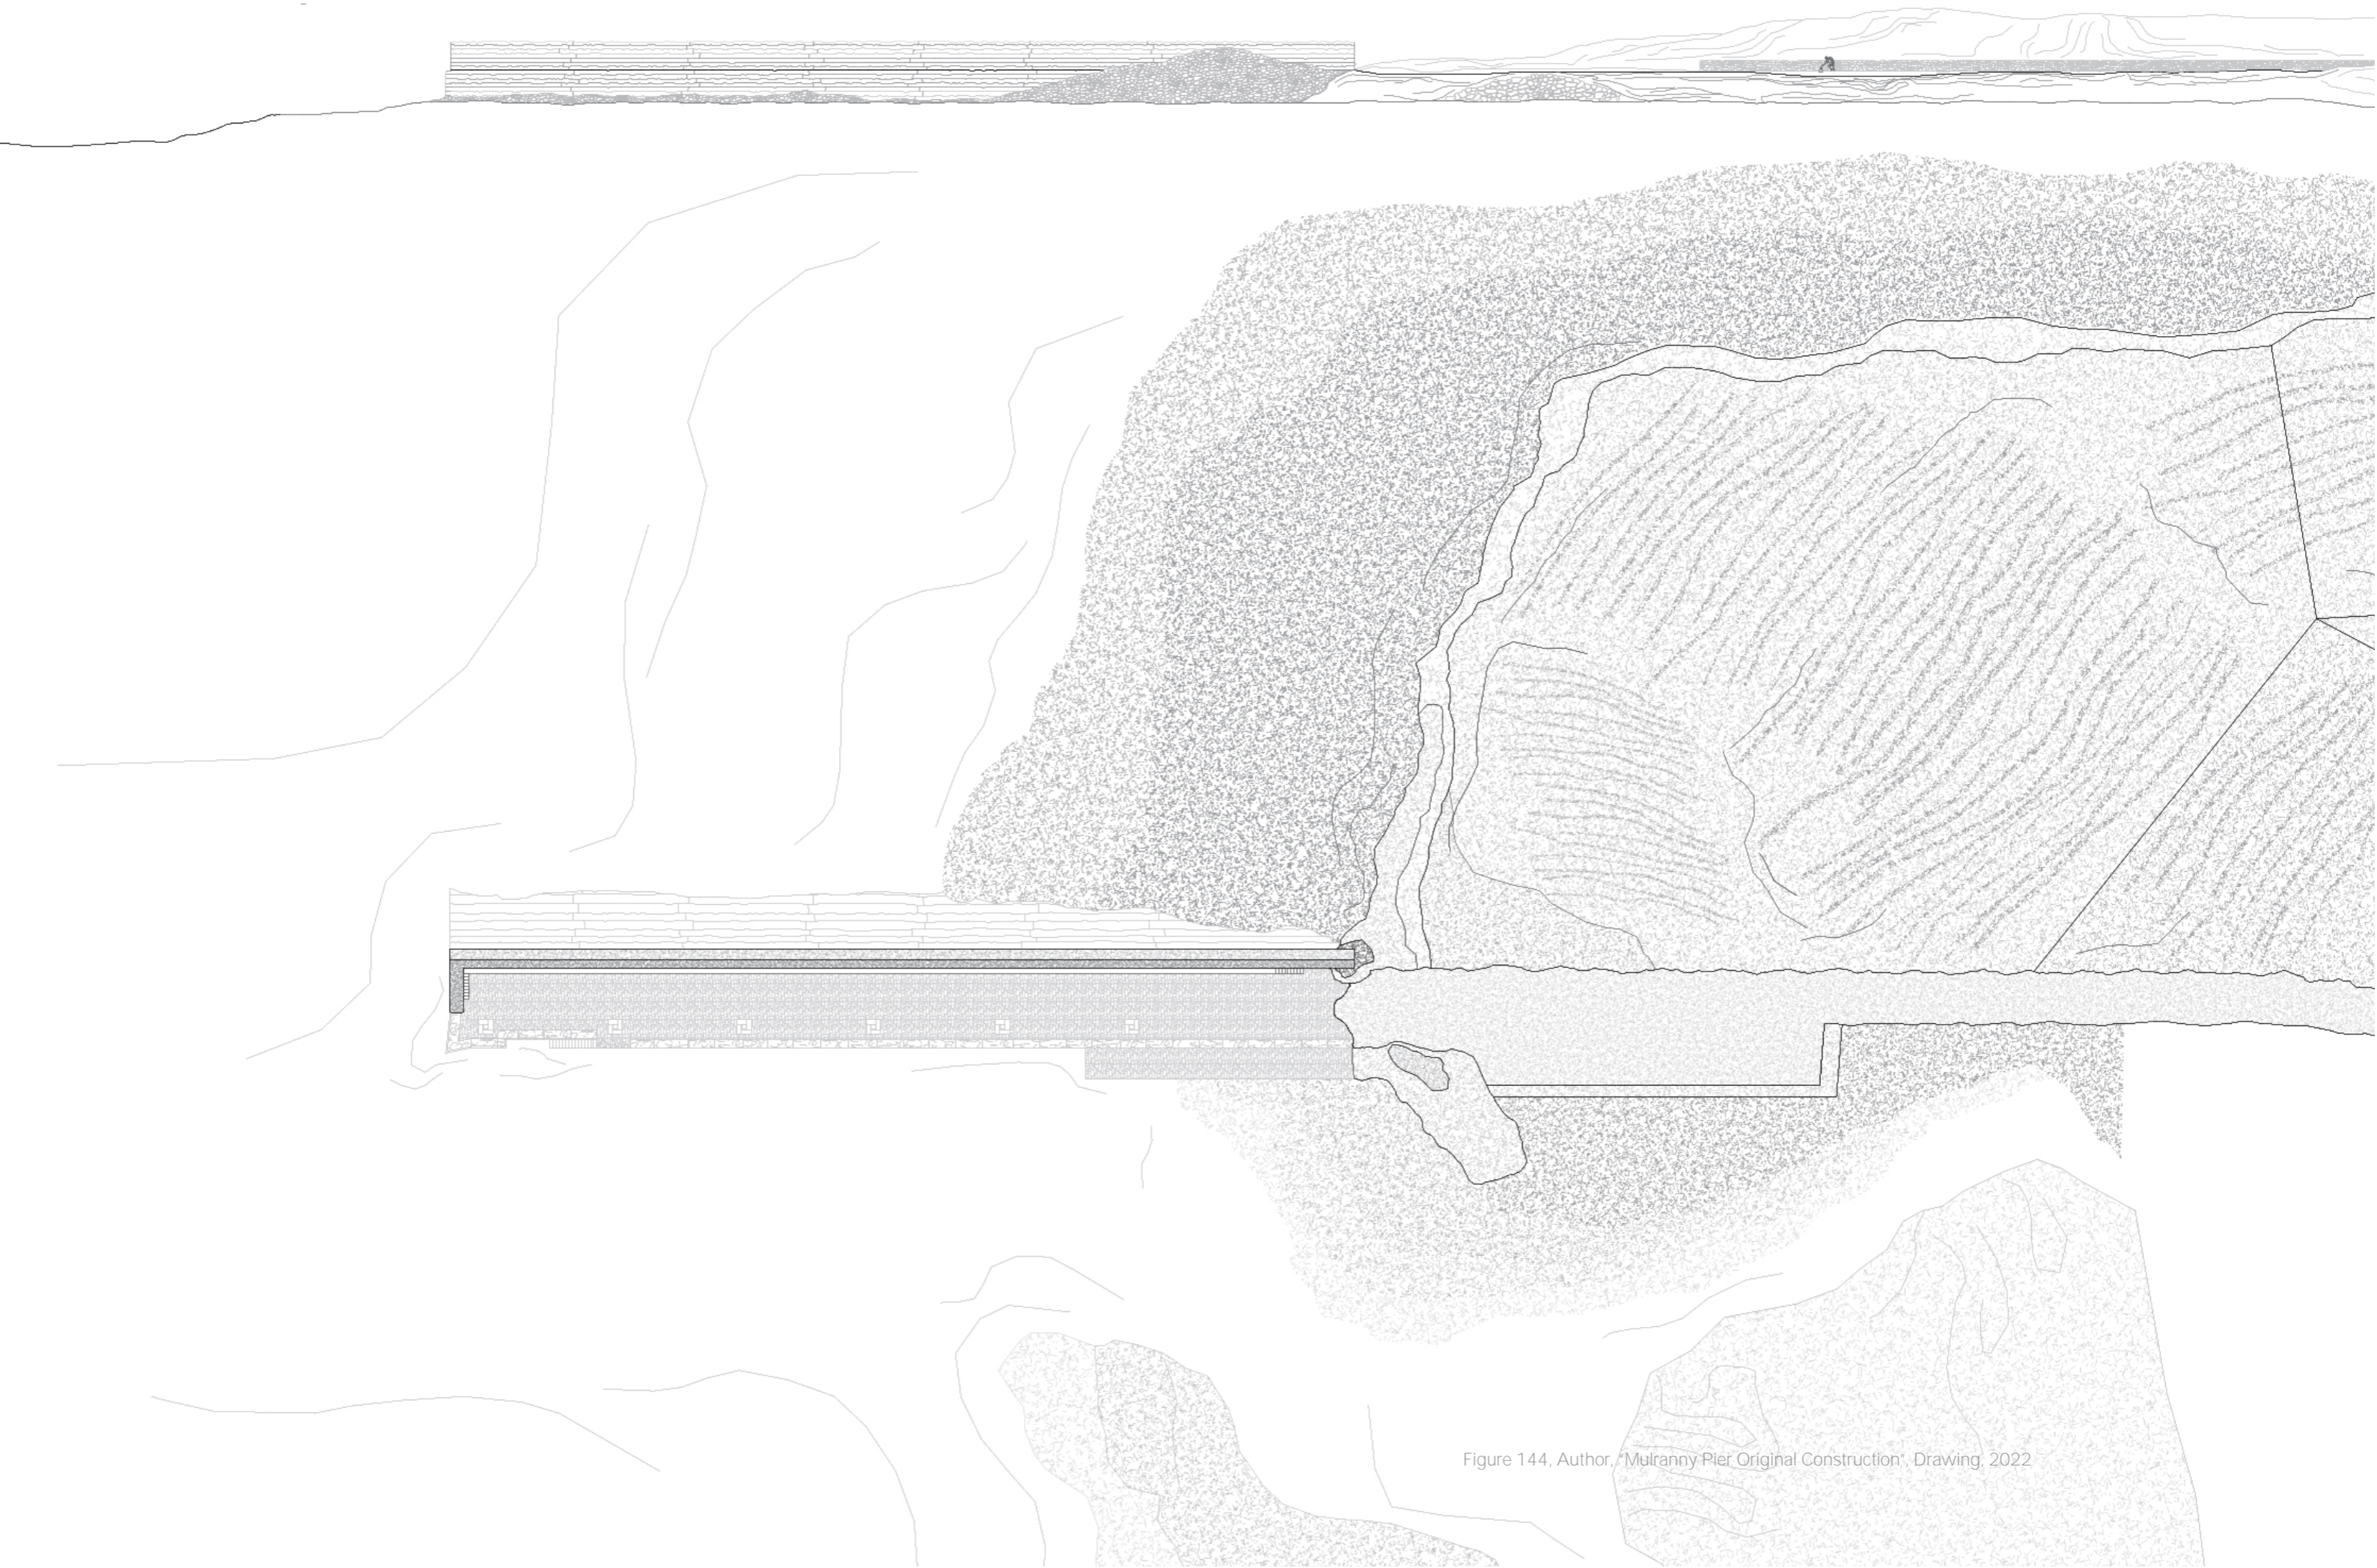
, Author, 'Mulranny Pier Original Construction', Drawing, 2022
